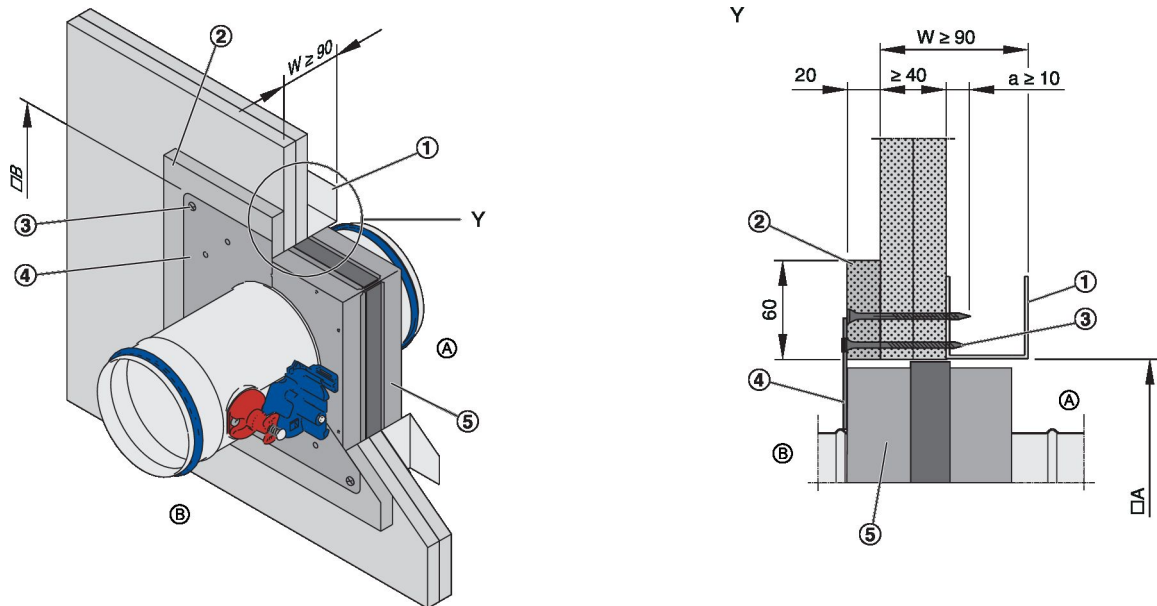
Dry mortarless installation in shaft wall with metal support structure
